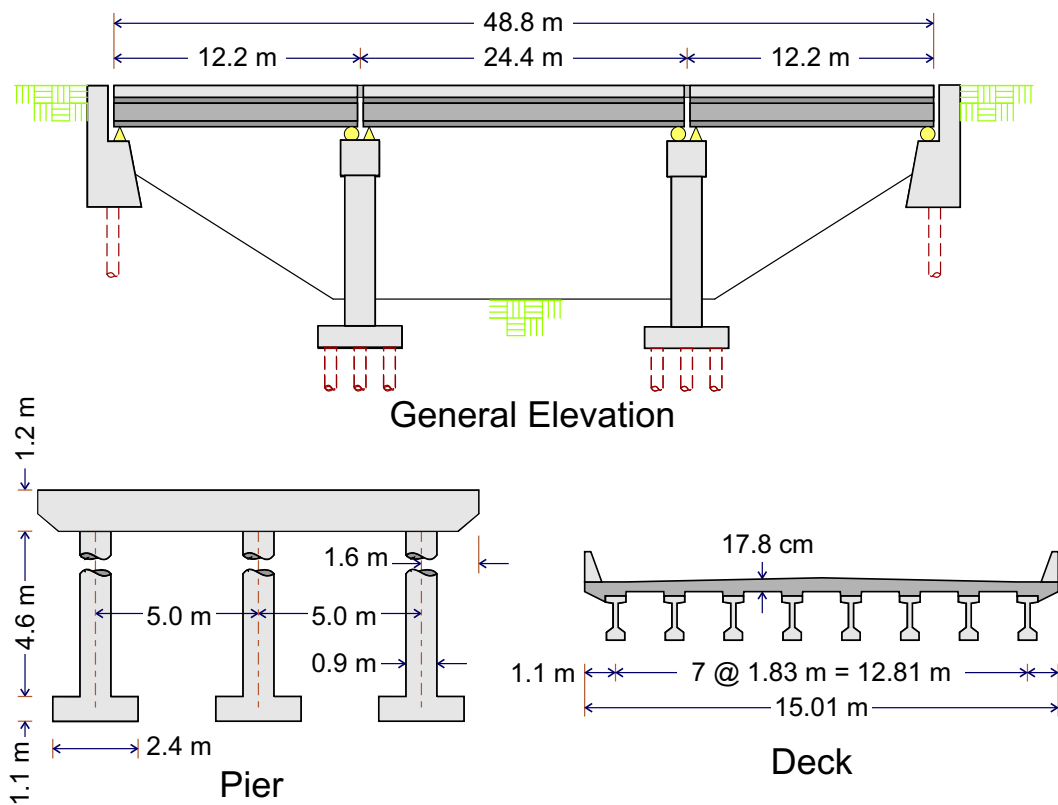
MSSS Concrete girder bridge typical geometry.
